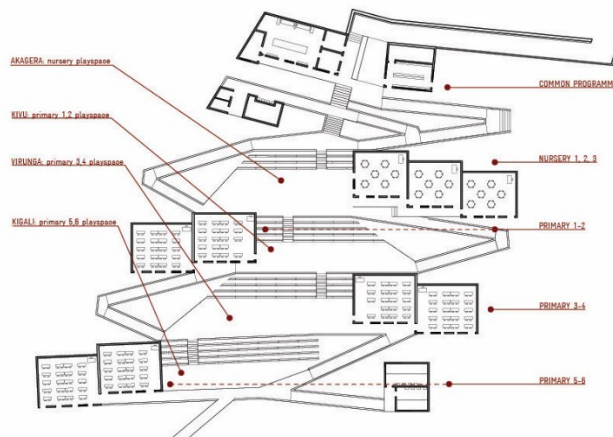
Umubano Primary School Building Diagram, Source: MASS Design Group.
